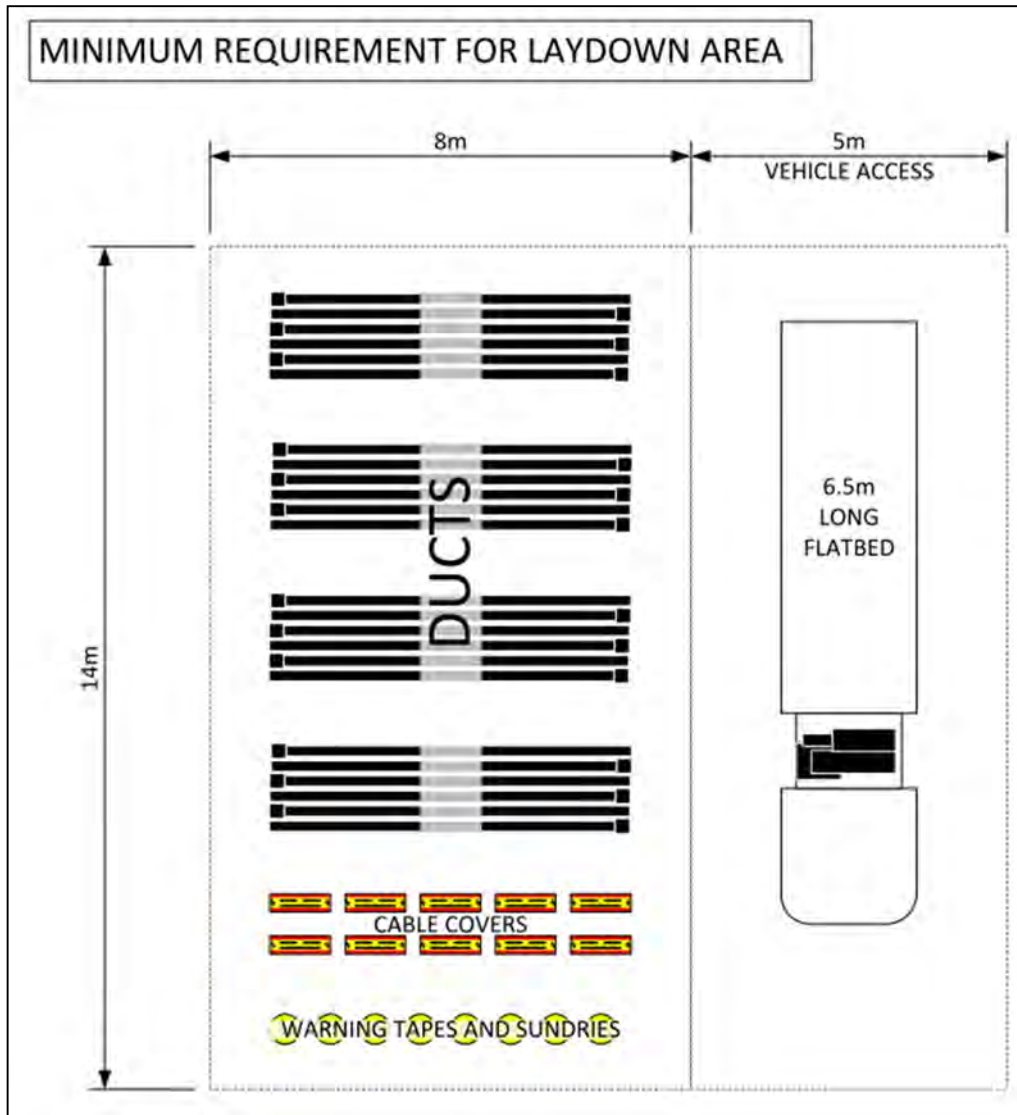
Typical Laydown Area Dimensions [at Joint Bay locations](#)
